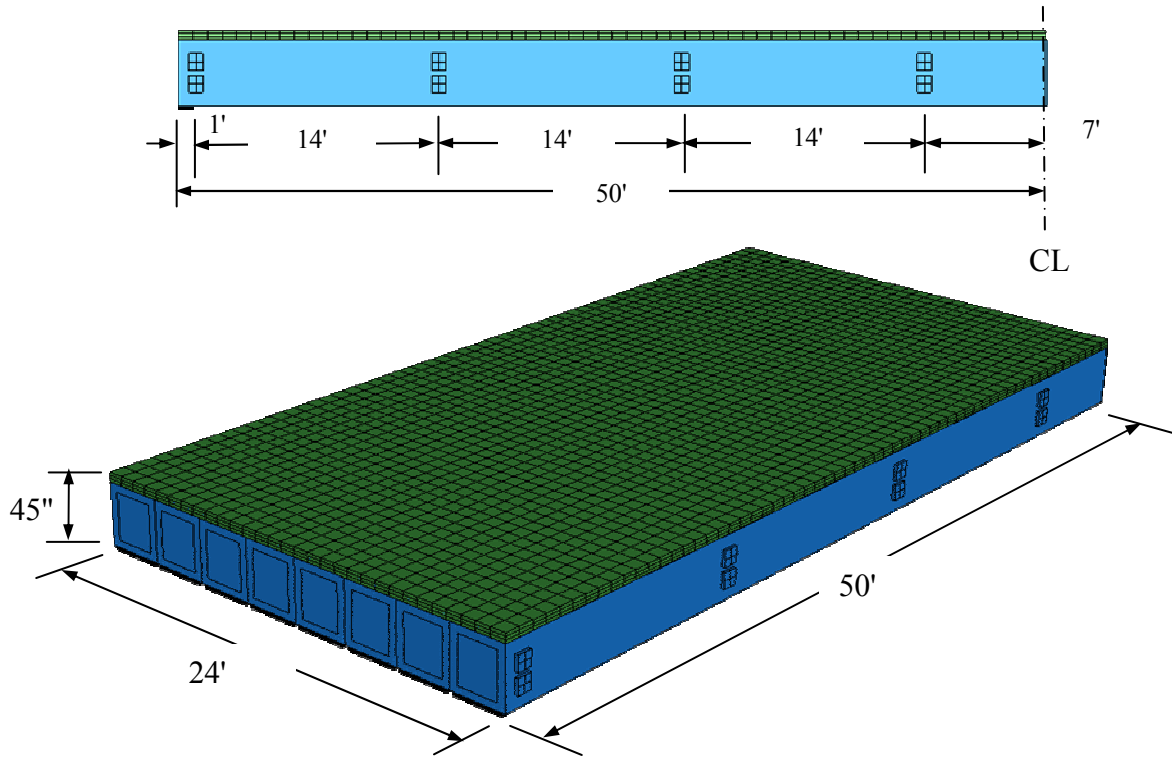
Modified assembly of 100 ft span bridge model constructed using 36 in. wide box-beams.
